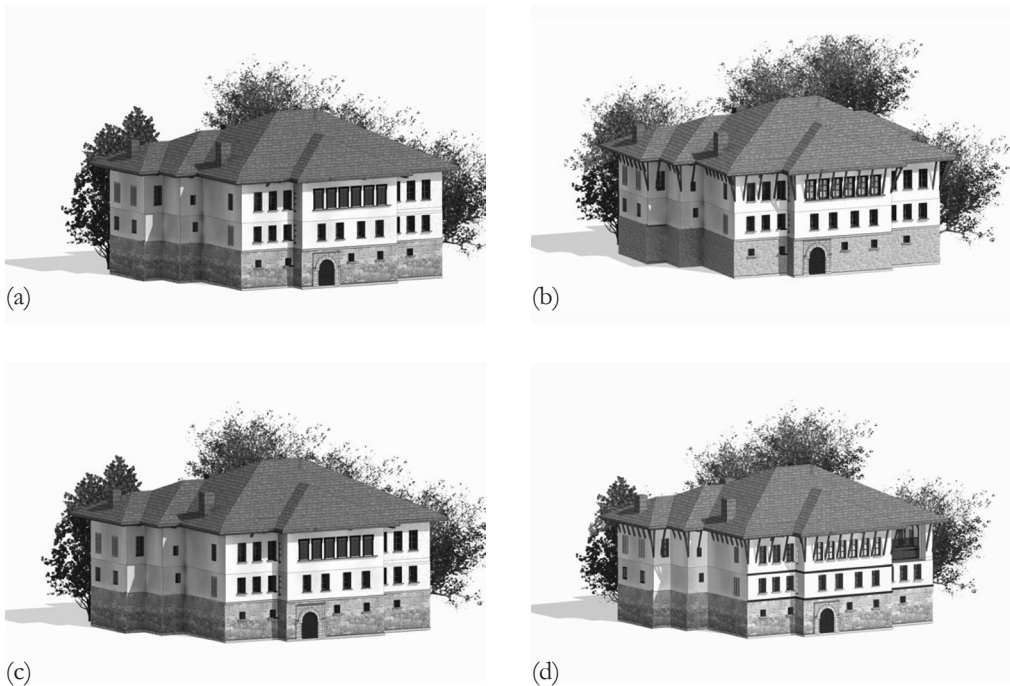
BIM architectural evolution model in Revit: (a) original 19th-century elements including stone masonry and stained glass; (b) 1940s interventions with plastered masonry, testeke (exposed timber beams), wooden frames and window alterations reflecting progressive material degradation; (c) current state marked by aluminum window replacements, façade moisture damage, cracking, and loss of testeke (timber components); (d) restoration proposal focused on reinstating original materials and features wooden windows, testeke, stained glass and cleaning masonry to restore structural authenticity and heritage value.
